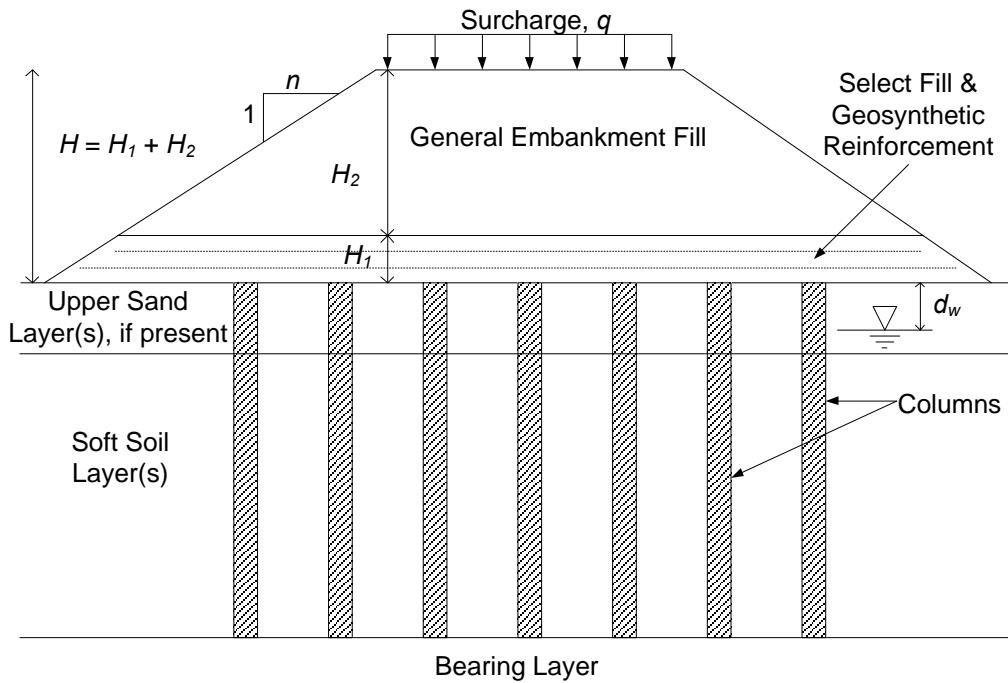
Column-supported embankment with geosynthetic reinforcement.
